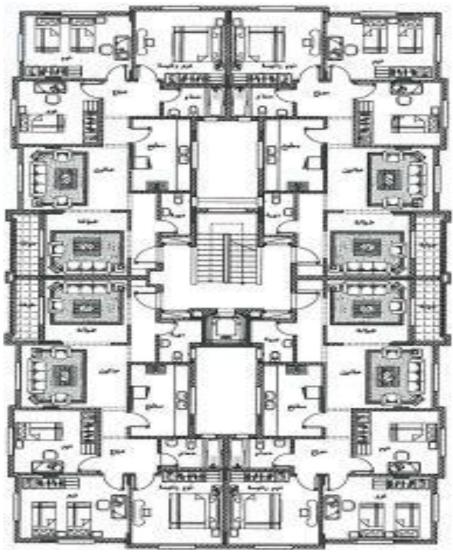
Typical floor plan for typical building at Al-Sheikh Hamad Housing Project (MPWH, 2017)
